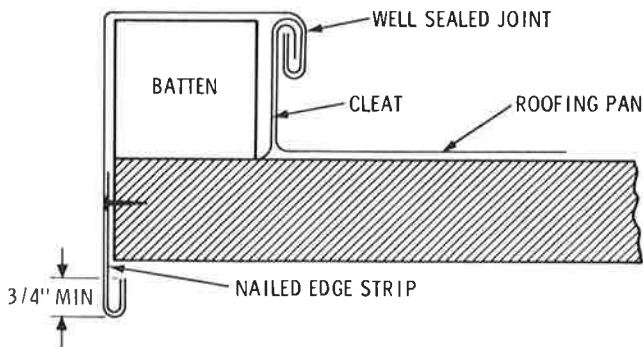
SHEETWORK DETAILS AT GABLE RAKES OR ROOF SIDES.
